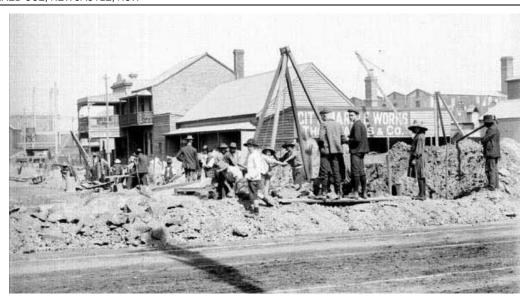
City Marble Works – located on Lot 1 of Thompson's subdivision. Photo depicts stores and residences on subdivision Lots 3 to 5 fronting Steel Street, c.1910. Snowball Collection, Newcastle Region Library.
